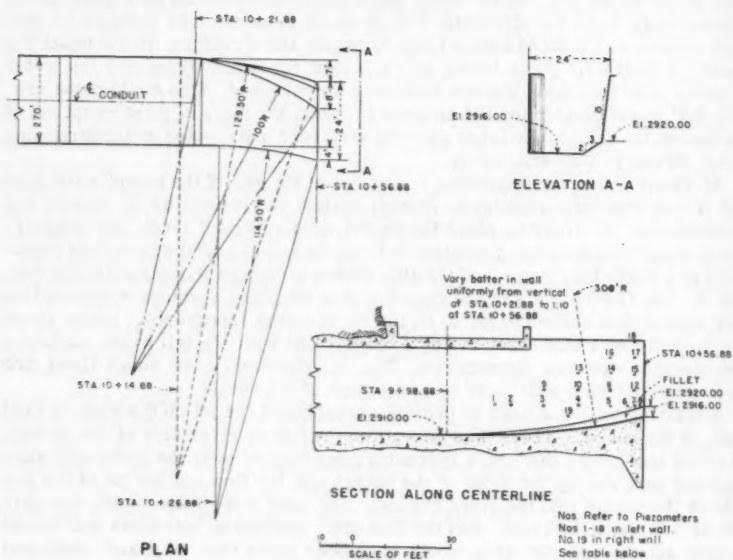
RECOMMENDED BUCKET, WU SHEH DAM
